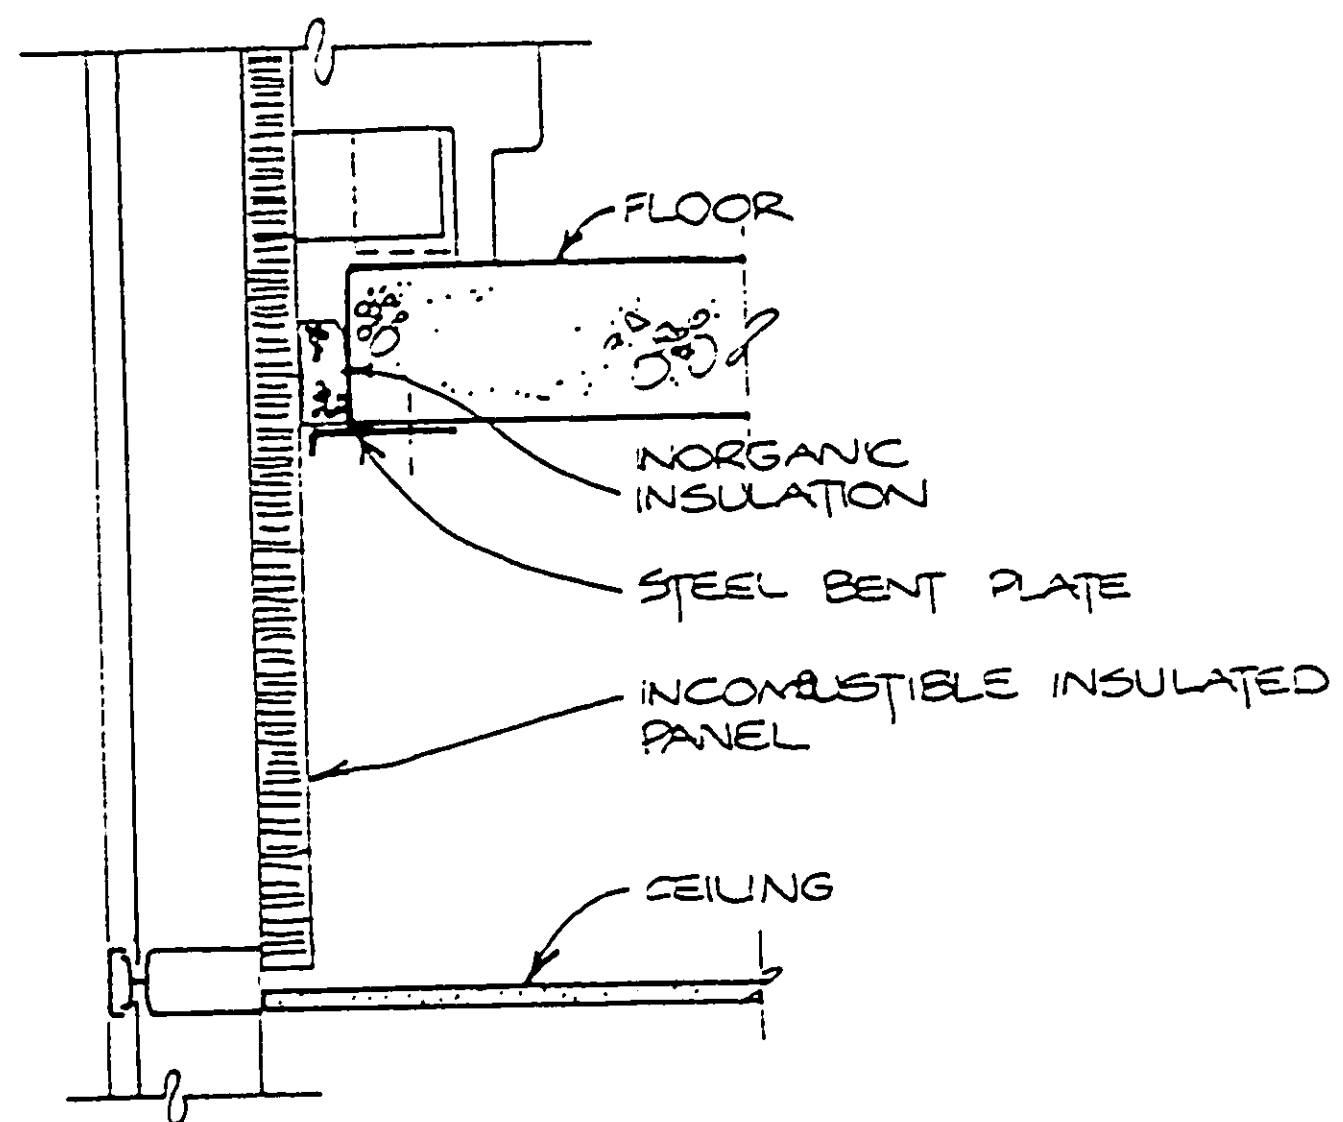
IN THIS CASE THE INSULATED PANEL COMPLETELY COVERS THE INTERIOR FACE OF THE MULLION. THIS ARRANGEMENT GIVES THE GREATEST PROTECTION AGAINST HEAT BUILD-UP WHEN THE SLAB IS CANTILEVERED AND FIRE TRAVELS ABOVE THE CEILING OR THE CEILING IS DESTROYED.
